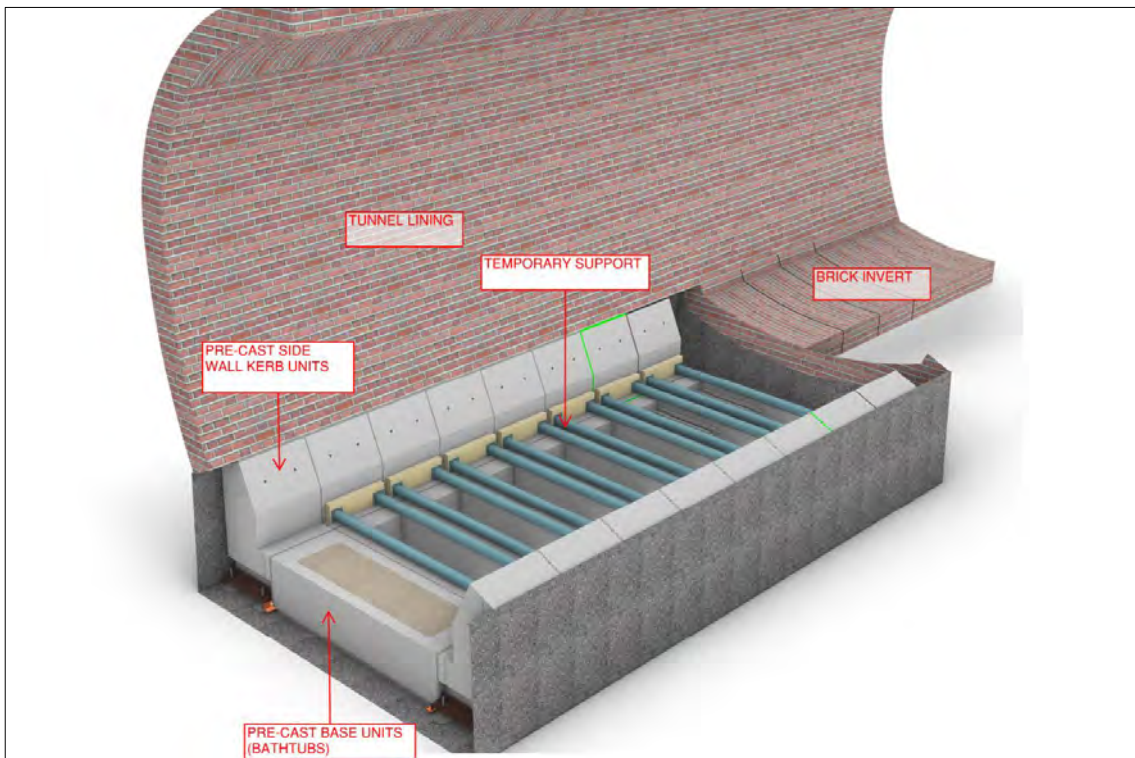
3D VIEWS SHOWING THE TEMPORARY SUPPORT SYSTEM AND INSTALLATION OF PRE-CAST CENTRAL AND SIDEWALL BASE UNITS AS SUPPORT TYPE INV-2 IN CLAY AND SAND AREAS OF THE TUNNEL. (SOURCE: AURECON/VLINE)
